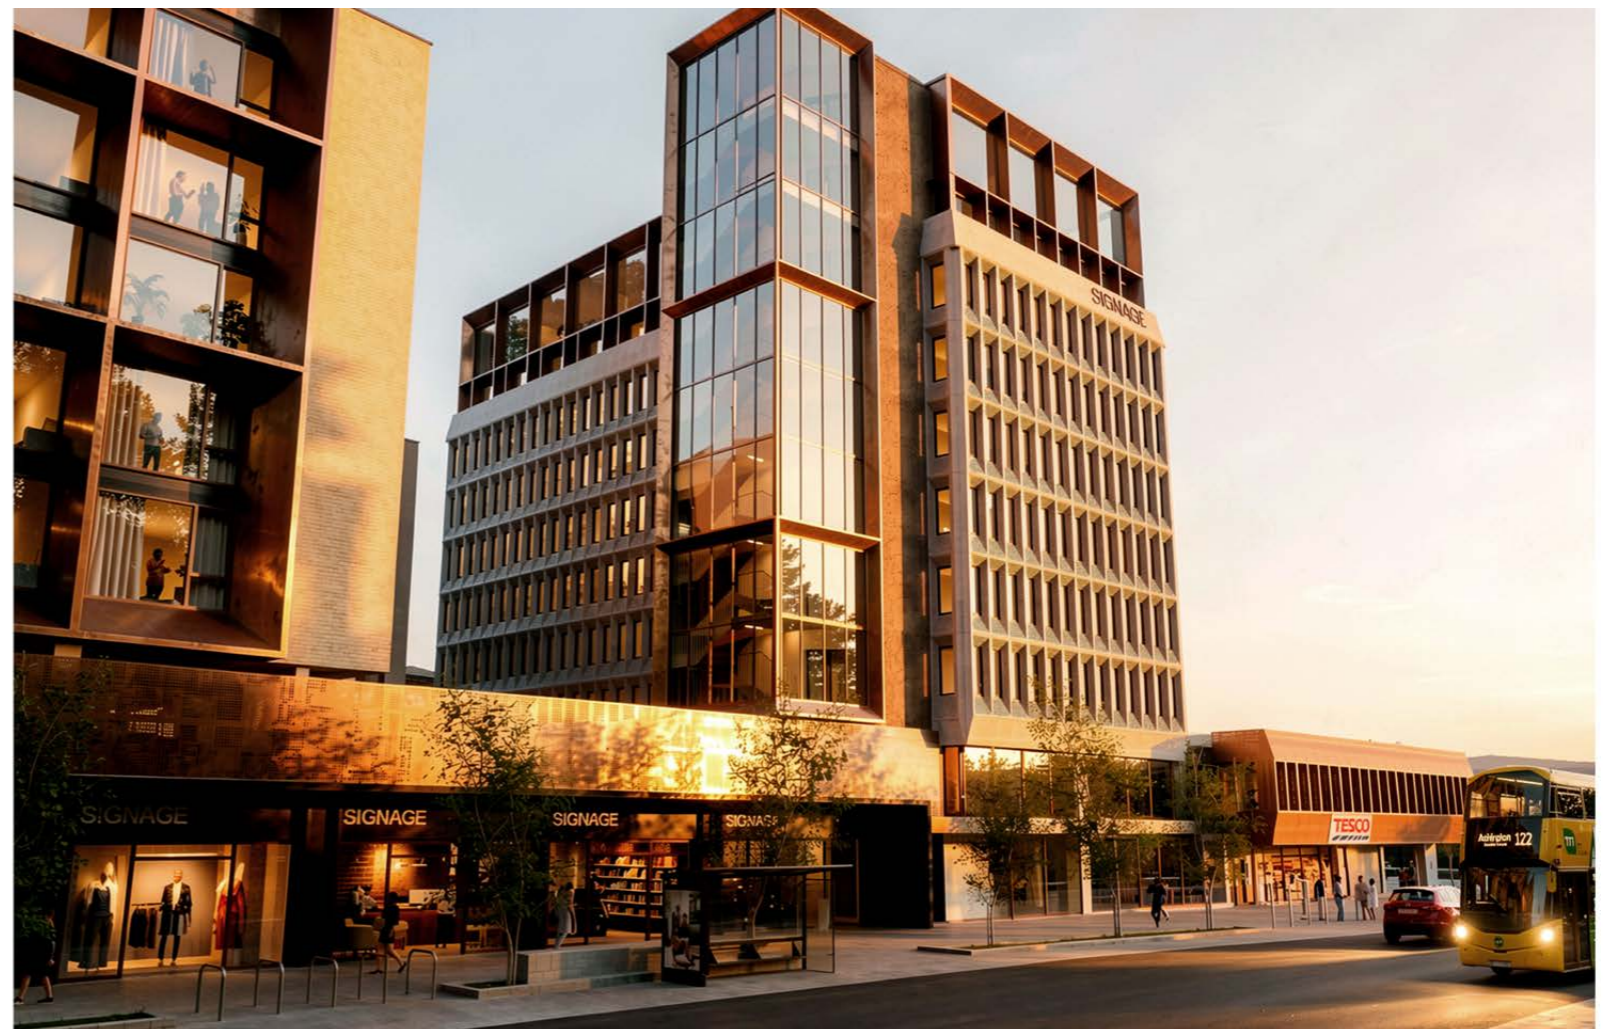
Residential Block with contrasting brick and 3-storey feature elements over ground floor level. Source: MCORM, 2026.
